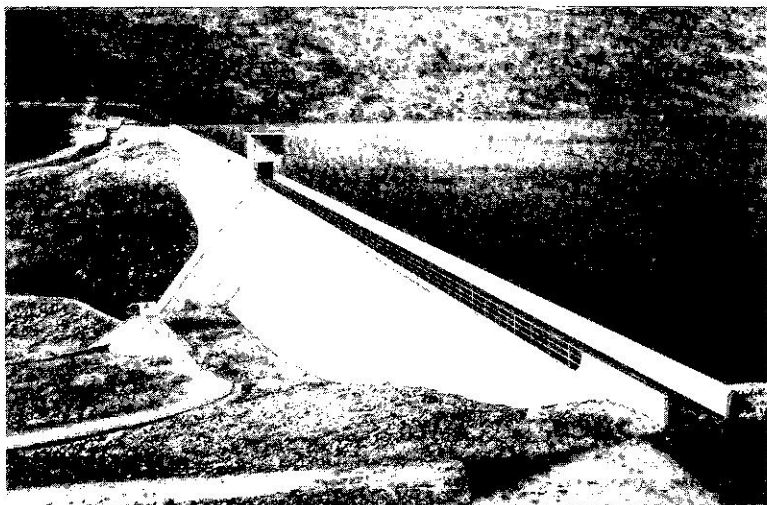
ALLT-NA-LAIRIGE PRESTRESSED CONCRETE DAM
